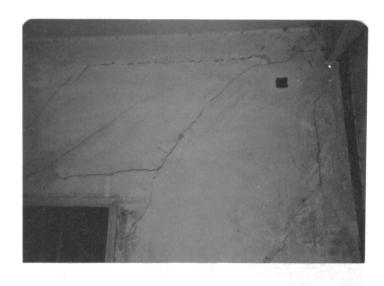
Example of Diagonal Cracks in Internal Walls of Main Building.
